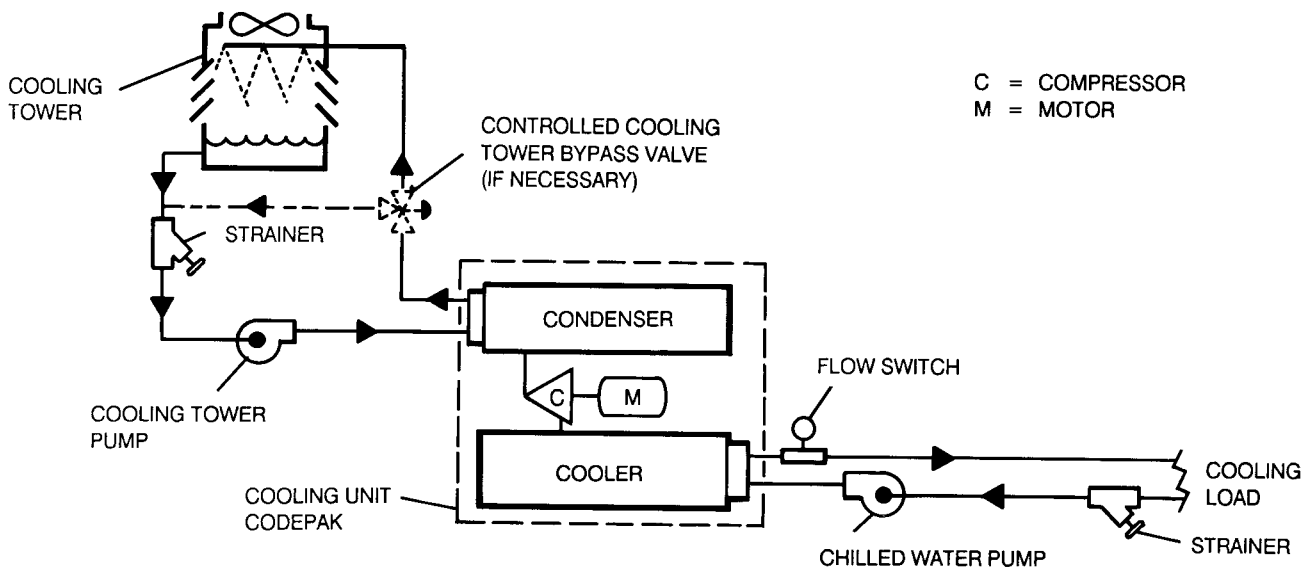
SCHEMATIC OF A TYPICAL PIPING ARRANGEMENT FOR COOLING ONLY CODEPAKS
